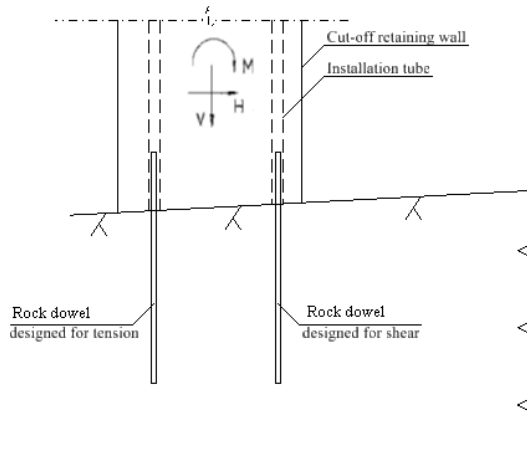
Section through the base of a cut-off wall connected to the rock by rock dowels where  $H$  is the horizontal force due to earth pressure behind the wall,  $V$  is the vertical force,  $M$  is the overturning moment.
